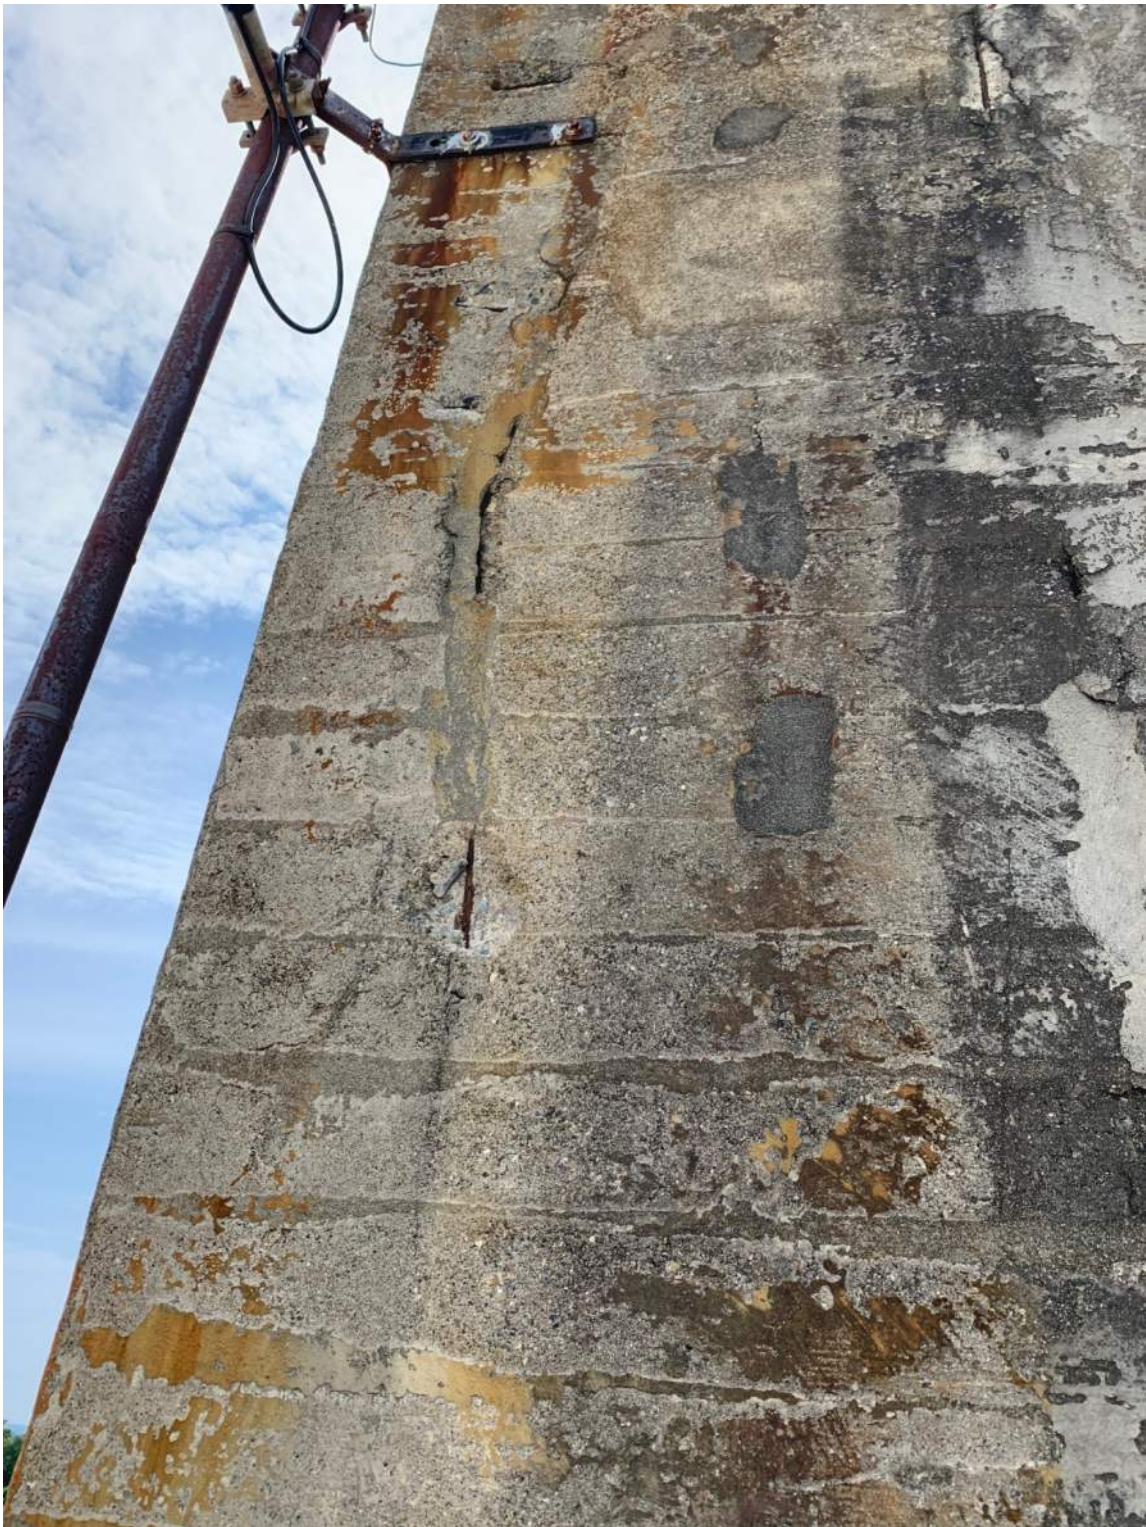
View of spalled and deteriorated concrete wall adjacent to freight elevator. Exposed rebar was also observed at several locations.
